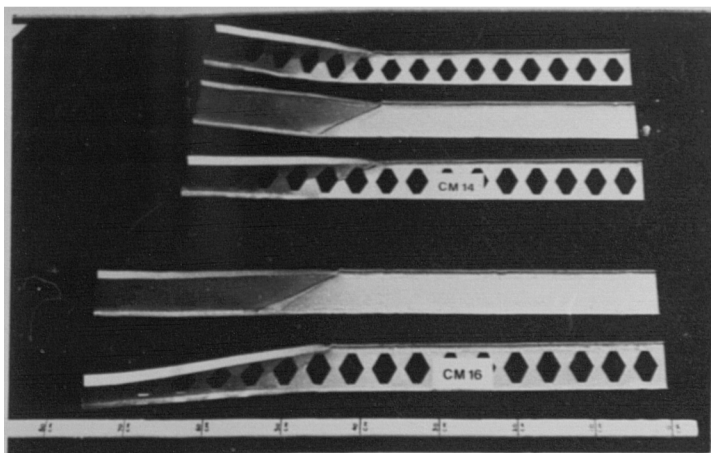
LOCAL BUCKLING FAILURE OF SHORT SMALL SCALE GIRDE S
